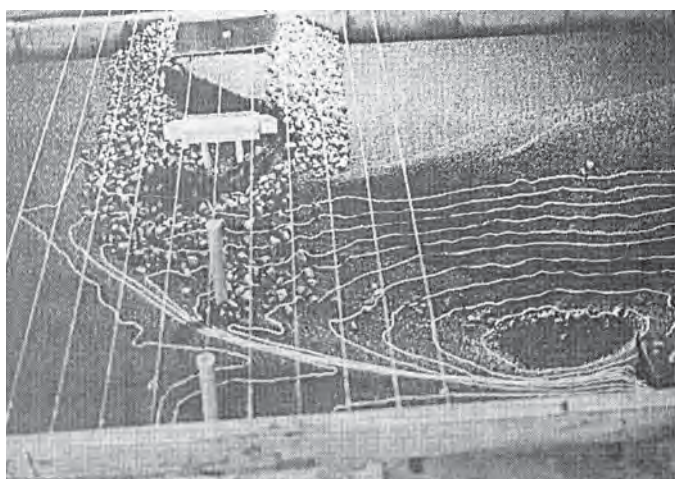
Bridge abutment and pier model, scale 1:40 (Croad, 1989).
